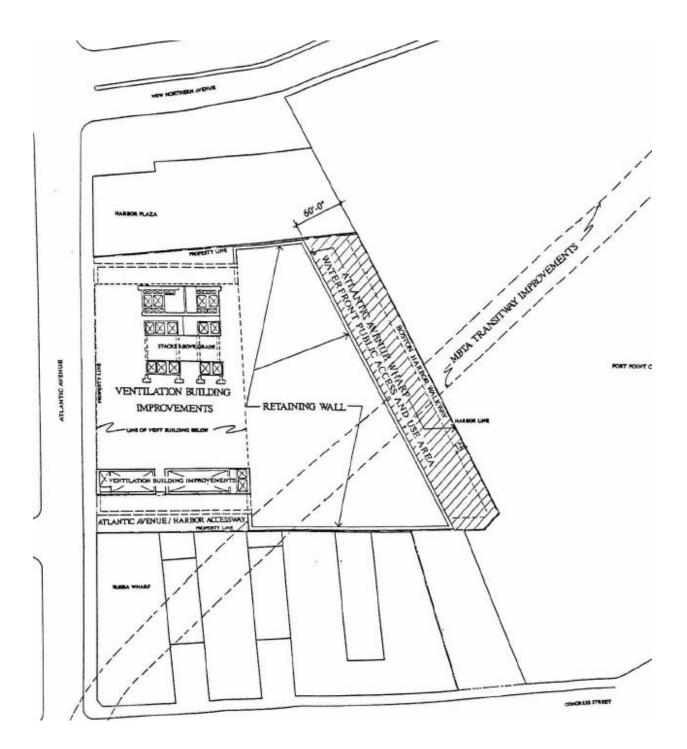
Atlantic Avenue Wharf Waterfront Public Access and Use Area as delineated in the Joint Plan (scan obtained from MassDEP hard copy of Joint Plan)
